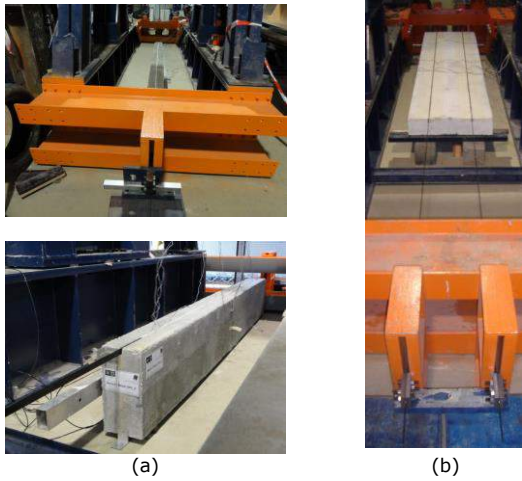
(a) RC beam with one prestressed NSM CFRP laminate, and (b) RC slab with two prestressed NSM CFRP laminates.
